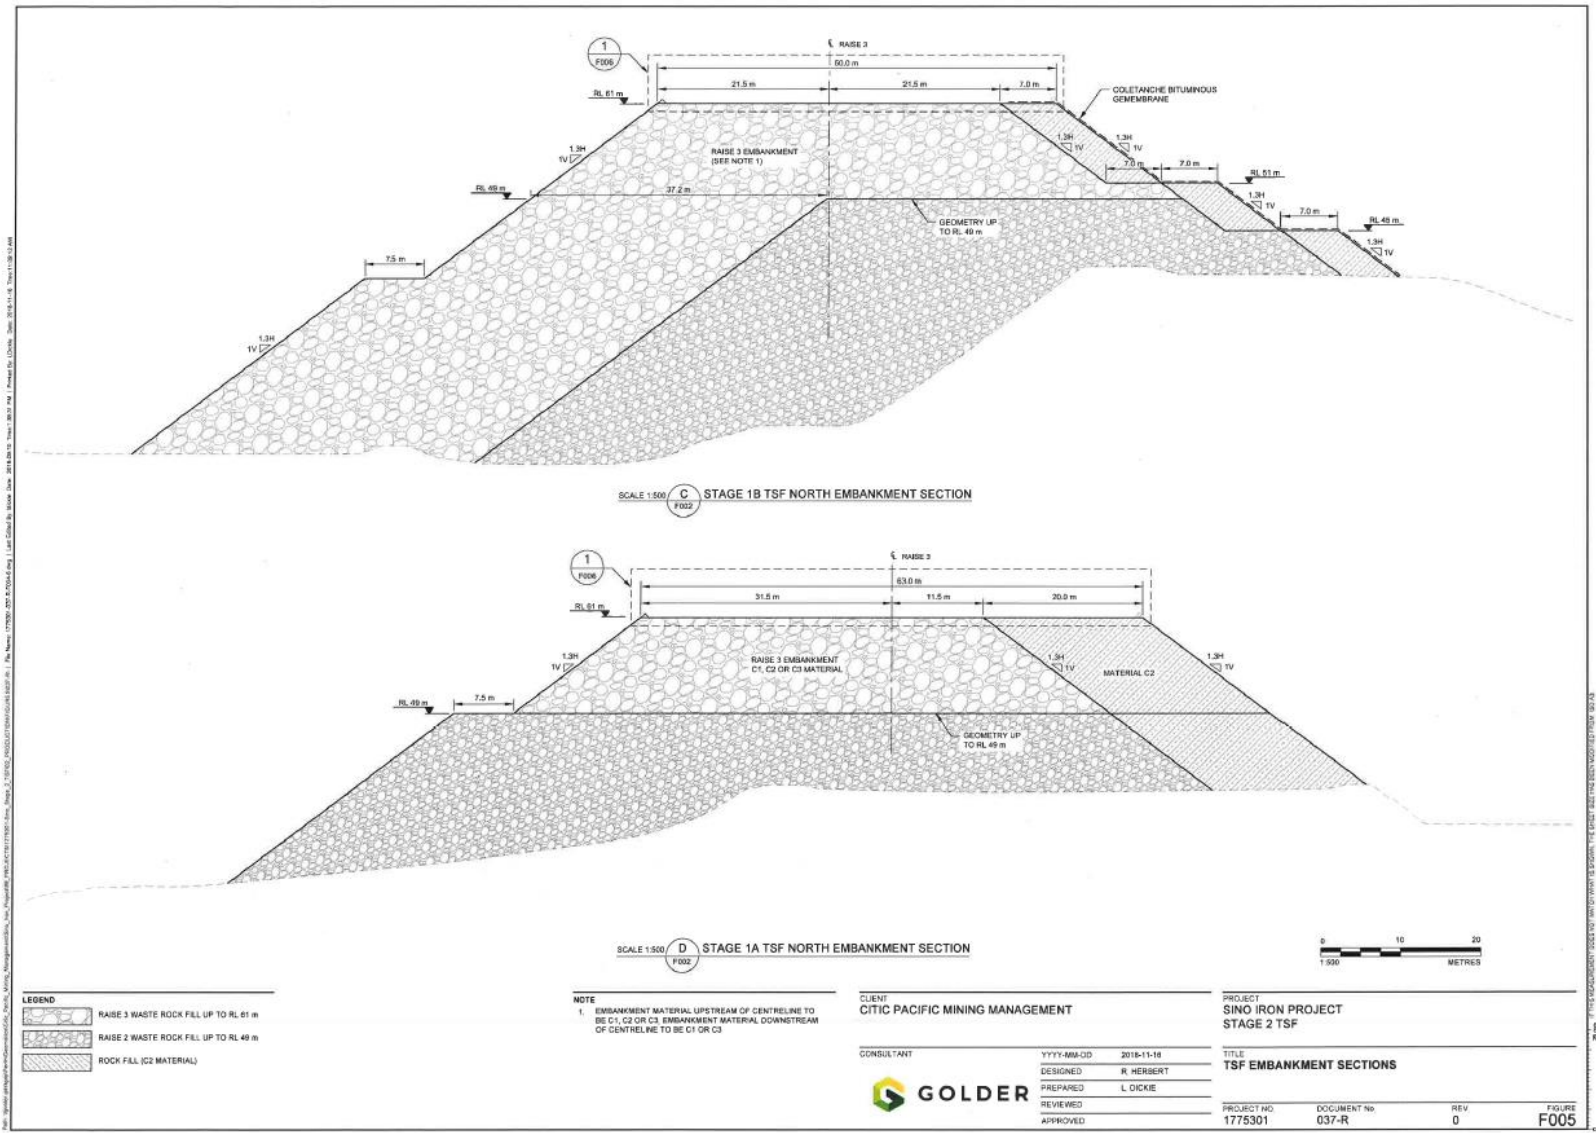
TSF Embankment Sections, north (CITIC Design Drawings, 2019)
